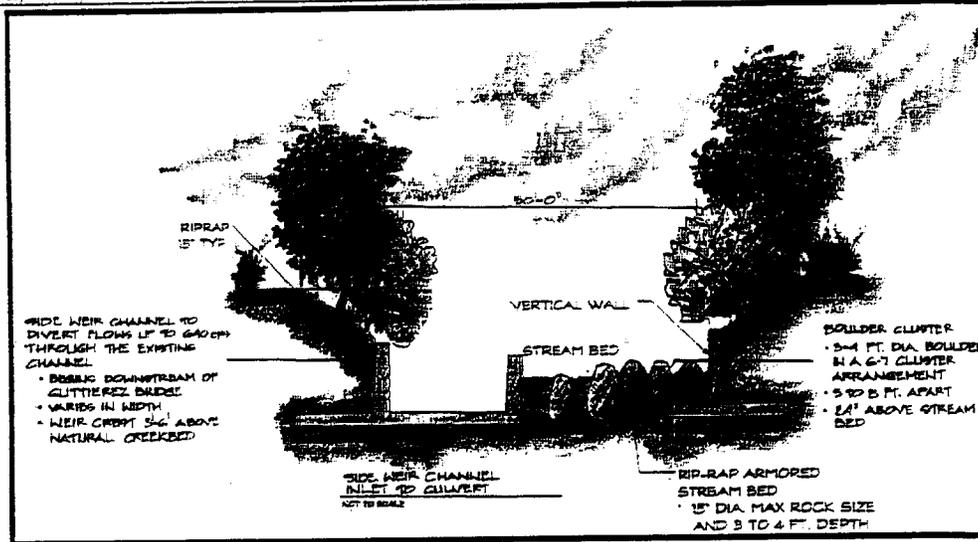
Representative Cross Section of Side Weir Channel Inlet to Overflow Culvert (Looking Downstream)
